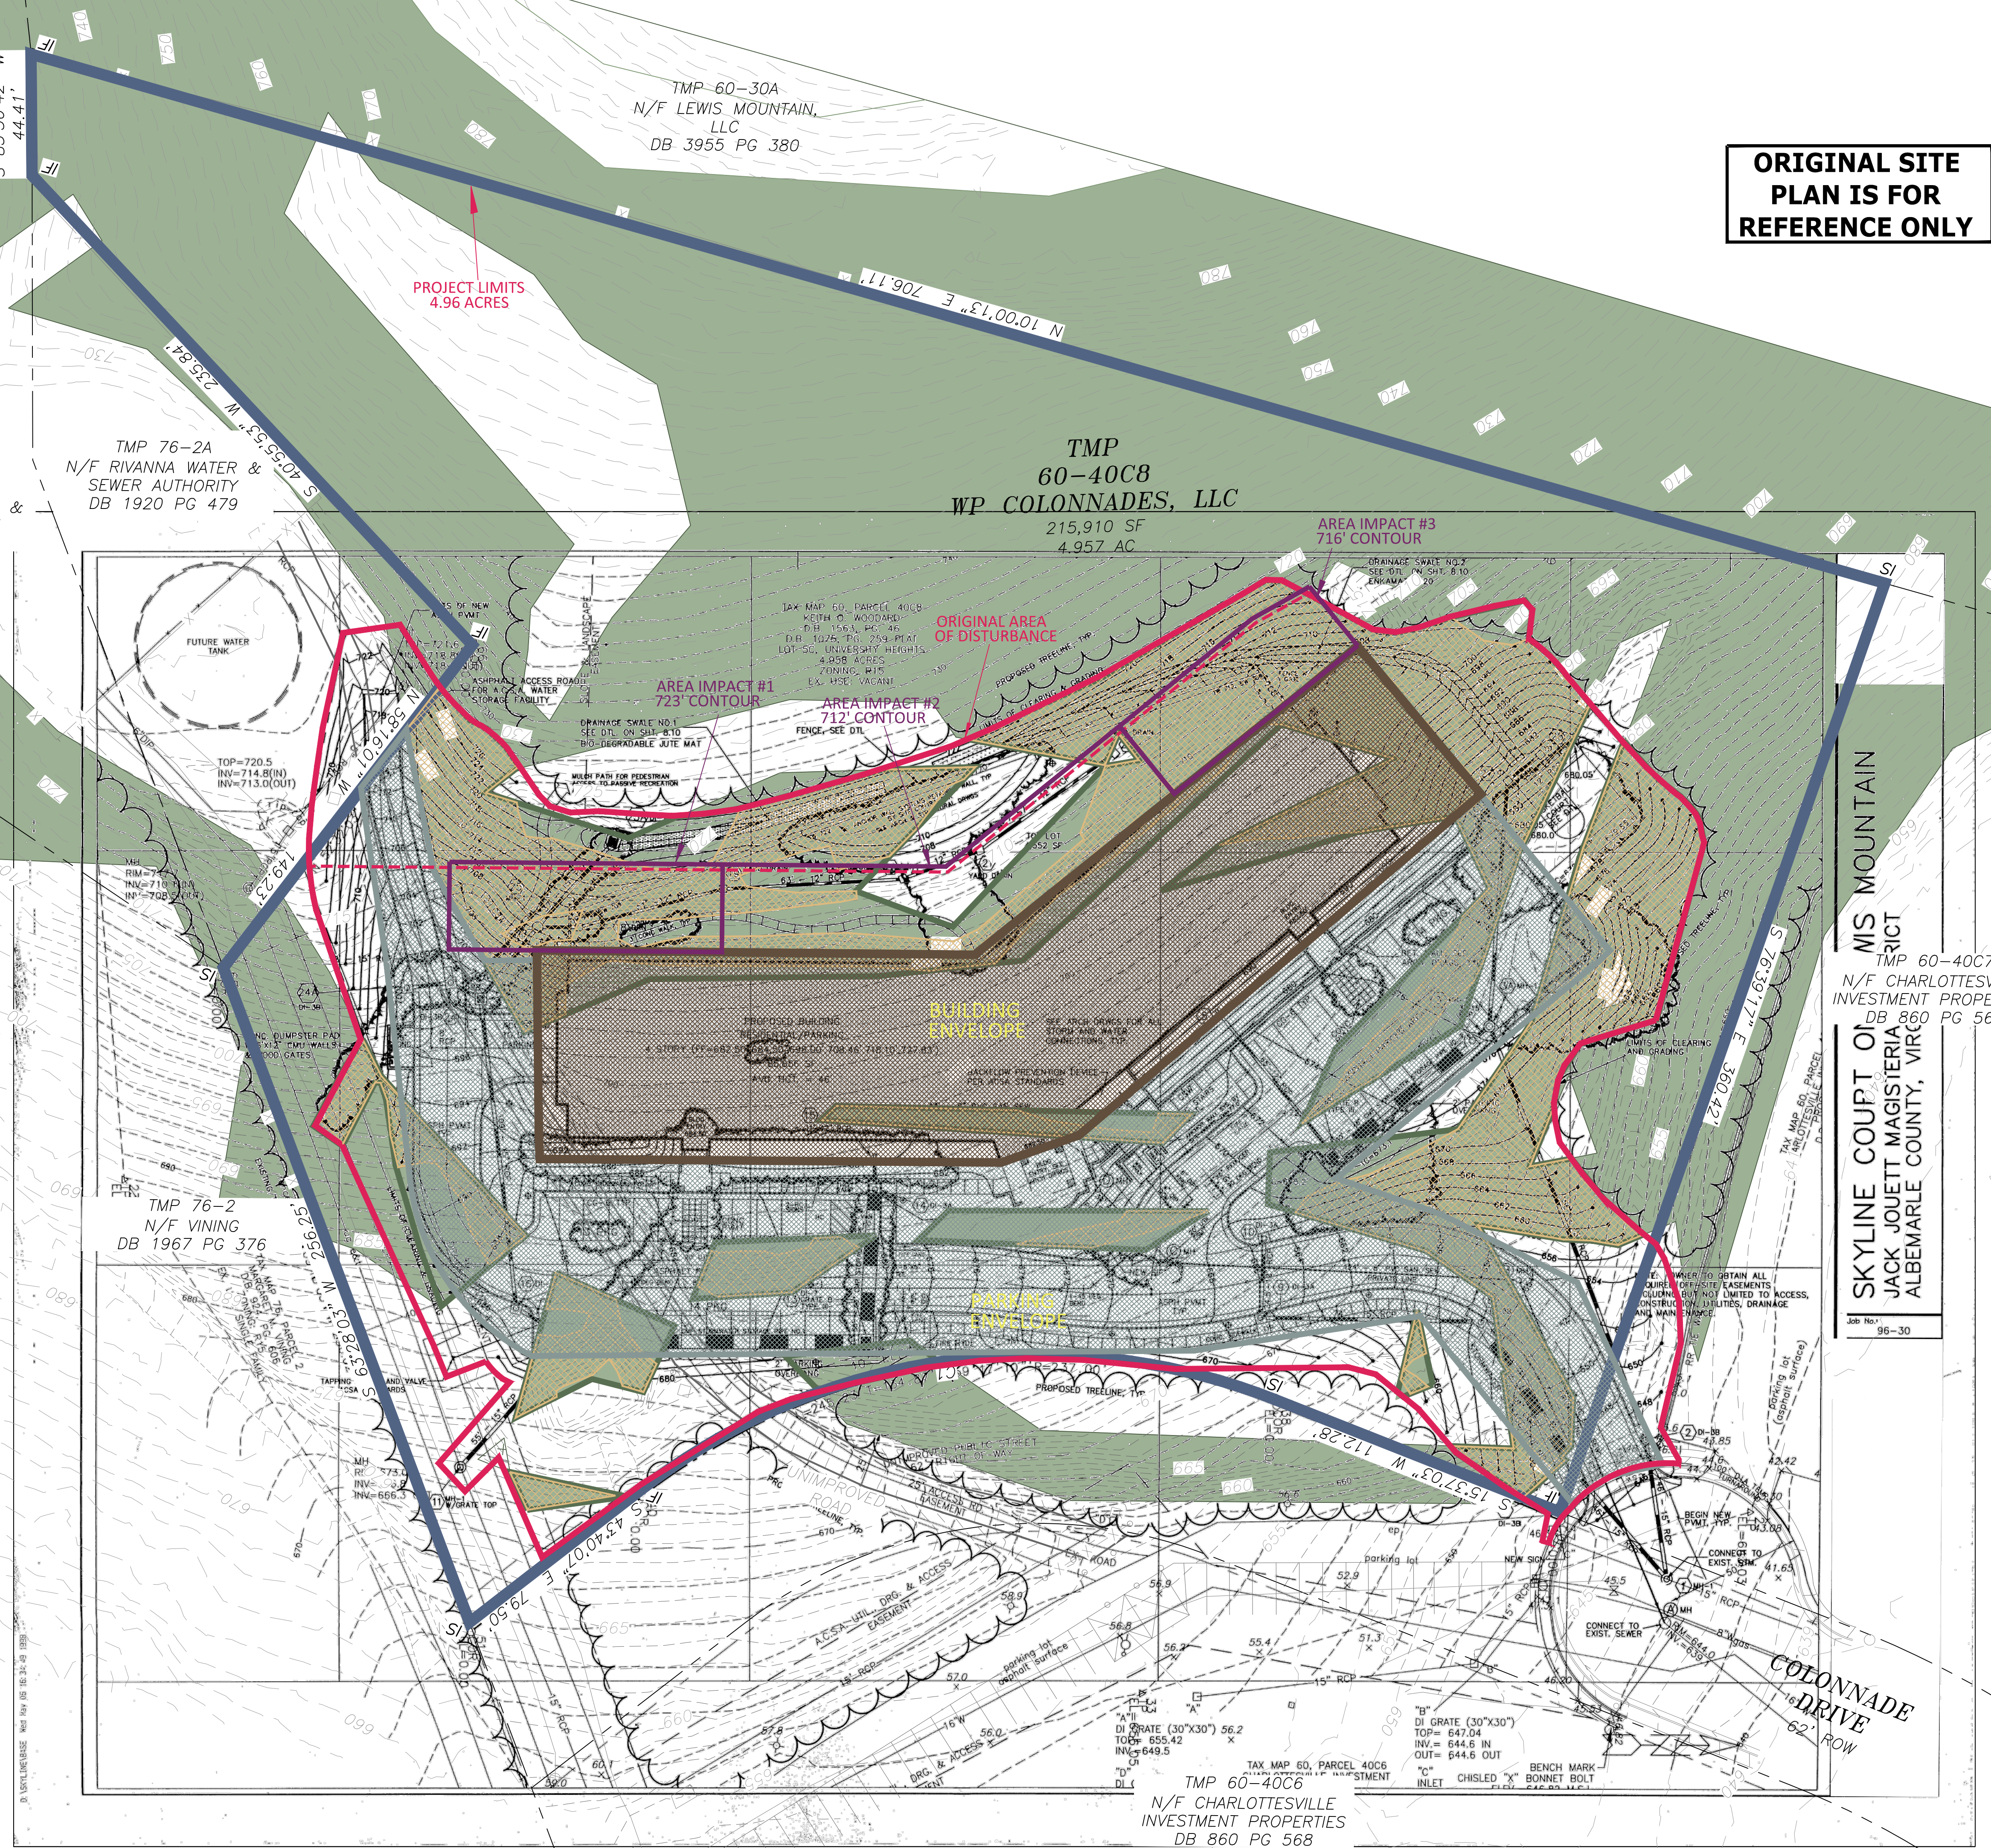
PROPOSED APPLICATION PLAN WITH PRESERVED STEEP SLOPE IMPACTS
